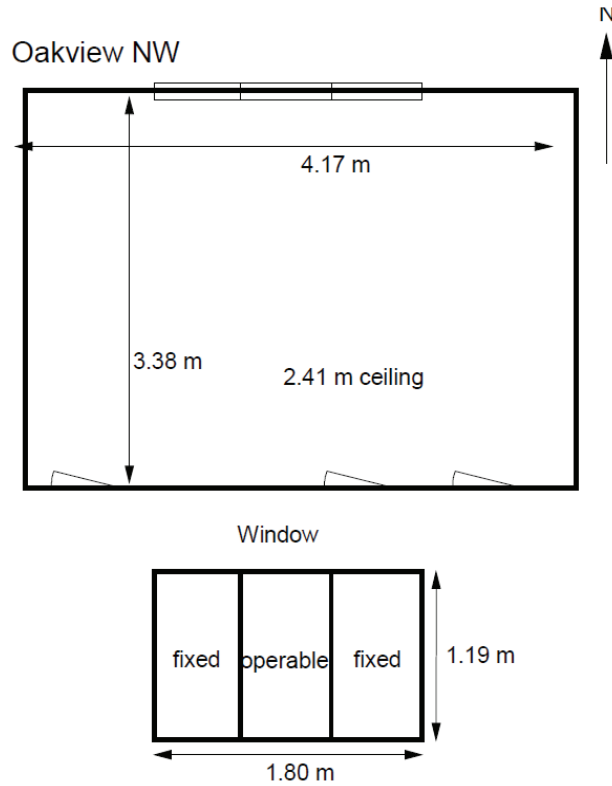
Plan of Oakview Northwest (NW) Bedroom. North and West walls exposed to aircraft noise. Reproduced from [14].
